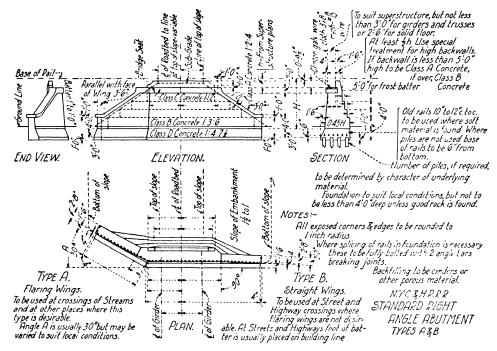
Masonry Abutments, N. Y. C. & H. R. R. R.
